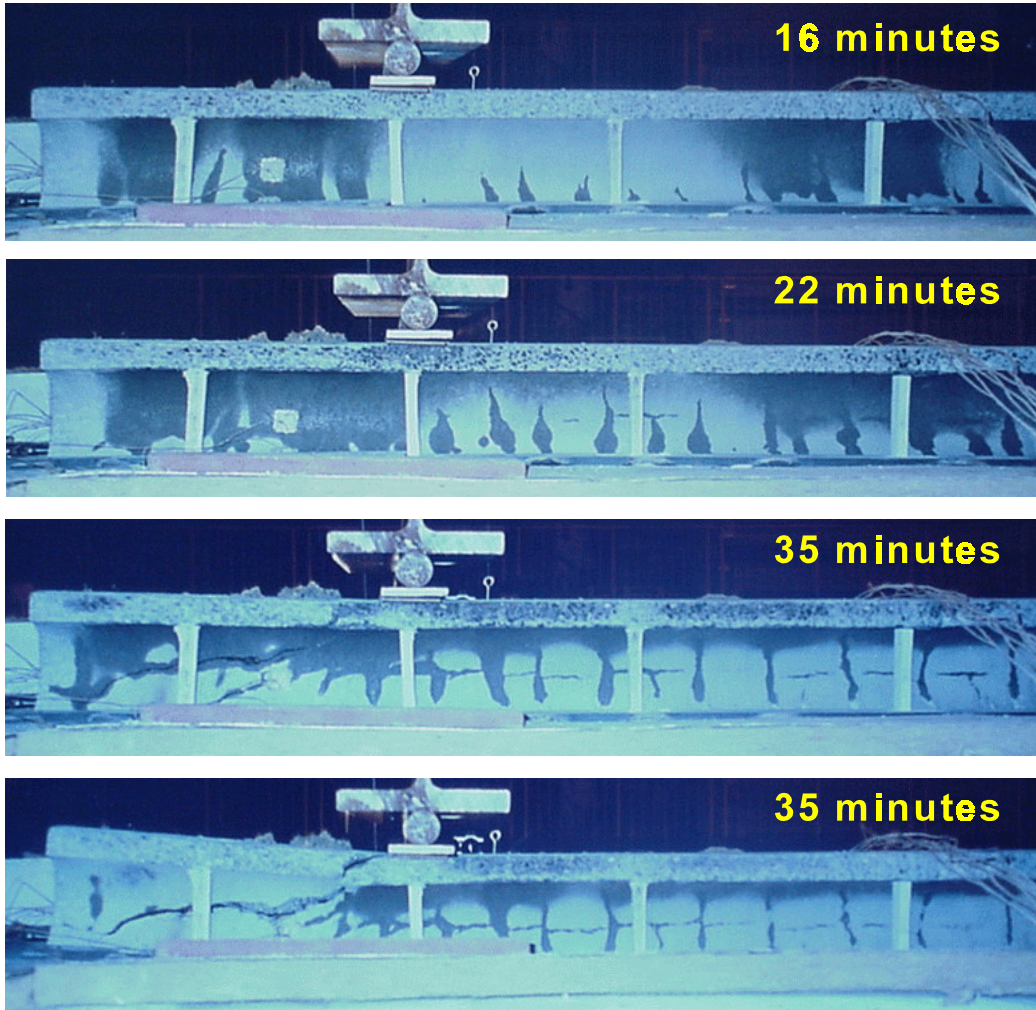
Typical crack pattern in unrestrained VX265 specimen.
